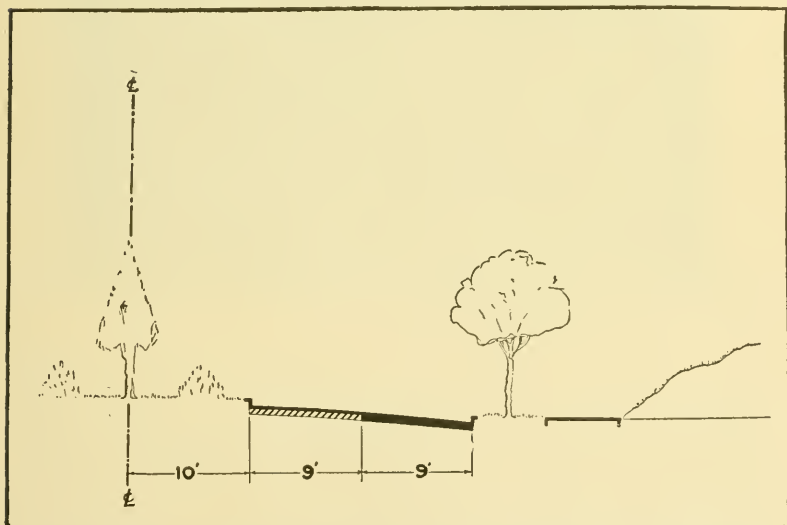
For the first improvement of a 56-ft. Traffic Highway two 9-ft. marginal strips of pavement with adjacent strips of cheaper construction should suffice. As traffic increases the development may be progressive until the entire 56-ft. width is paved.
